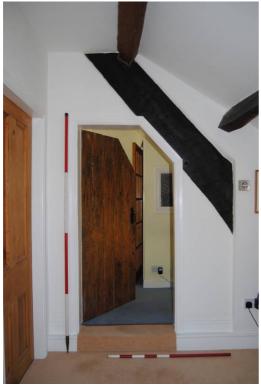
Cruck [T2] (N); Room [1F01] looking west.
